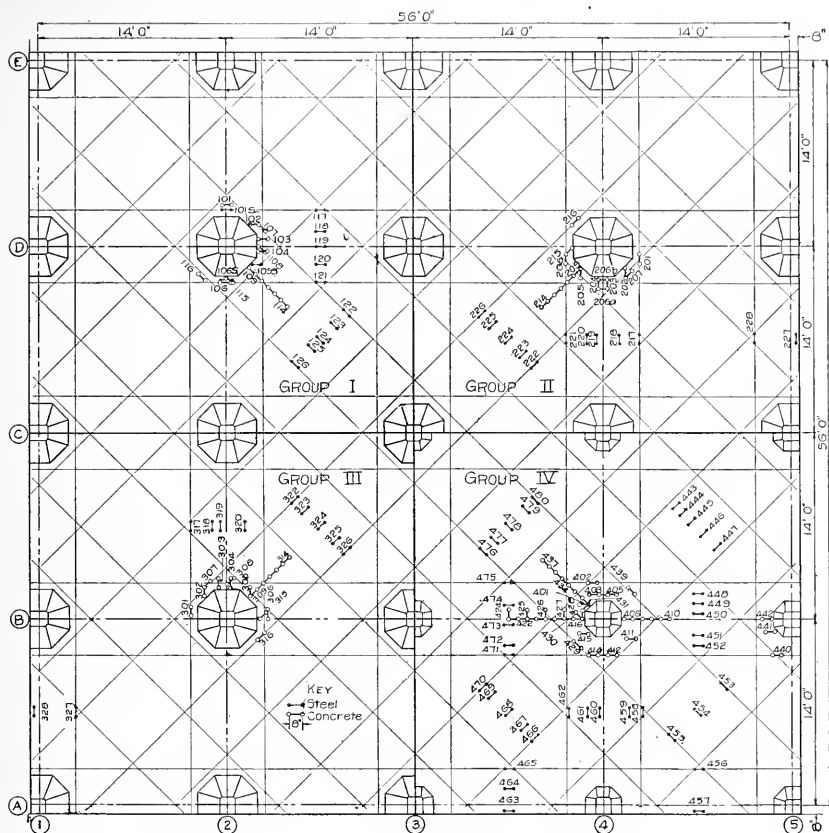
LOCATION OF GAGE LINES ON UNDER SURFACE OF WORCESTER TEST FLOOR.
